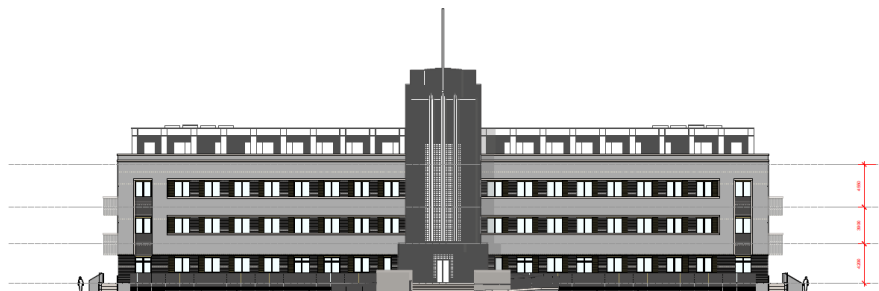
Extract of Design and Access Statement showing the Current Planning Application and proposed North-West elevation.
